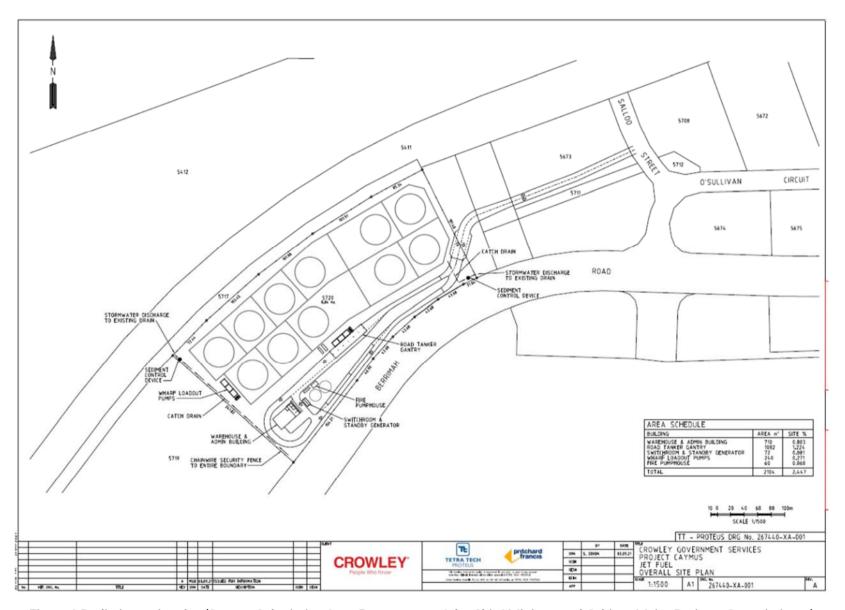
Preliminary site plan (Source: Submission from Department of the Chief Minister and Cabinet Major Projects Commissioner)
